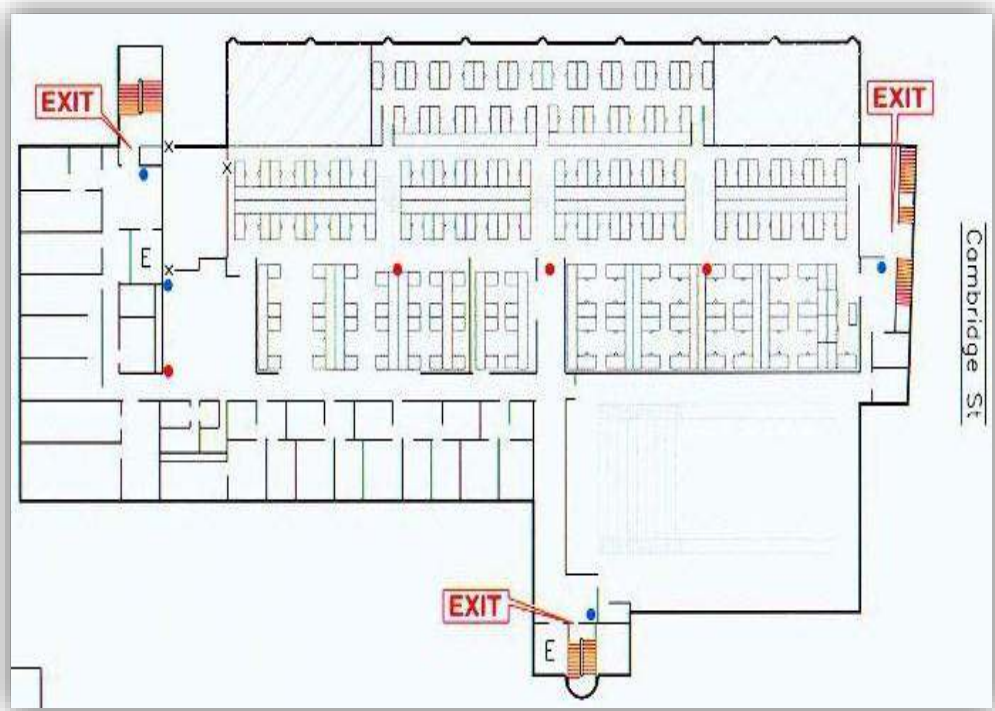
Second floor plan of the Harvard Graduate school of Design.
